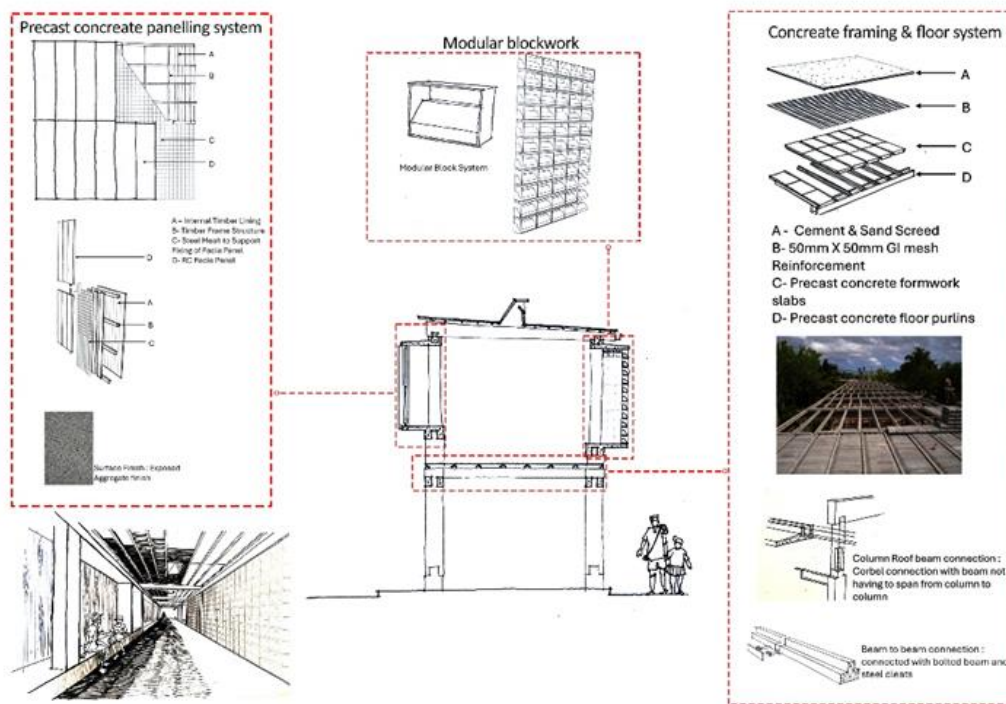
Prefabrication as technical base: The bridge is designed as a composition of three cement-based building components: precast concrete panelling, concrete framing system and modular cement blockwork
